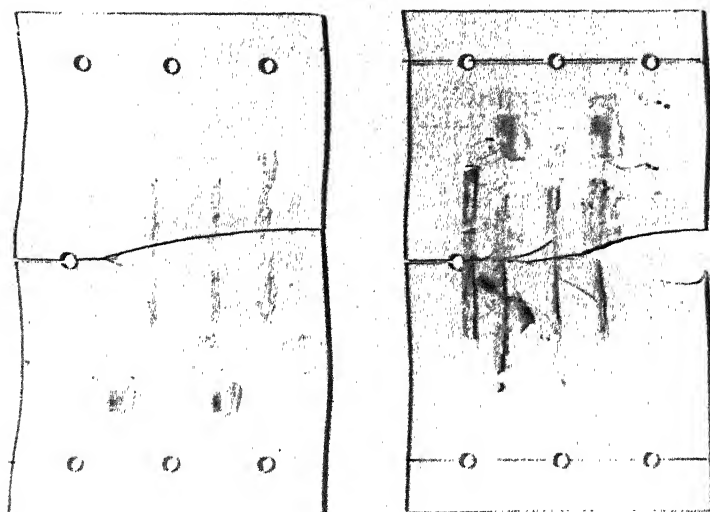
Photograph of the fractured specimen in Expt. # 3
